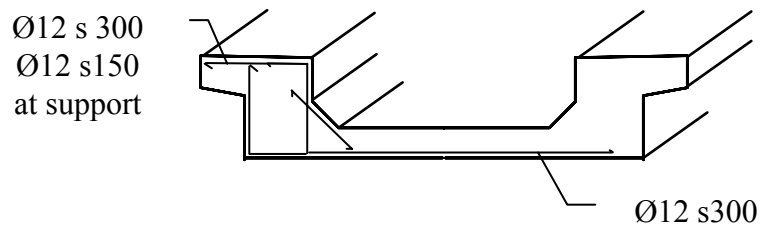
Cross section of the trough girder showing the reinforcement subjected to corrosion.
